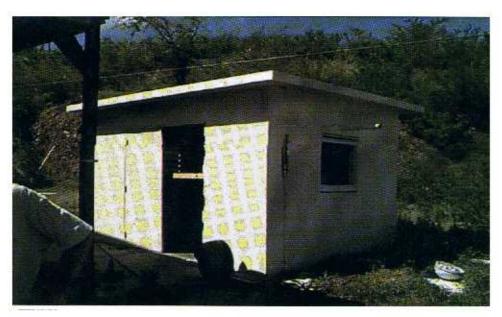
A missile traveling right to left struck the window louver. The door frame was attached by fasteners into wooden plugs that had been set into holes drilled into concrete. Once the louver failed, the door frame failed.
